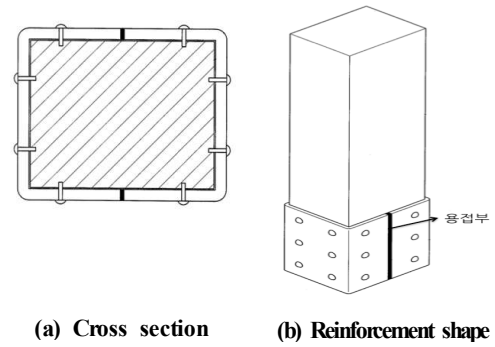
Cross Section and Reinforcement Shape of the Existing Reinforced Method
